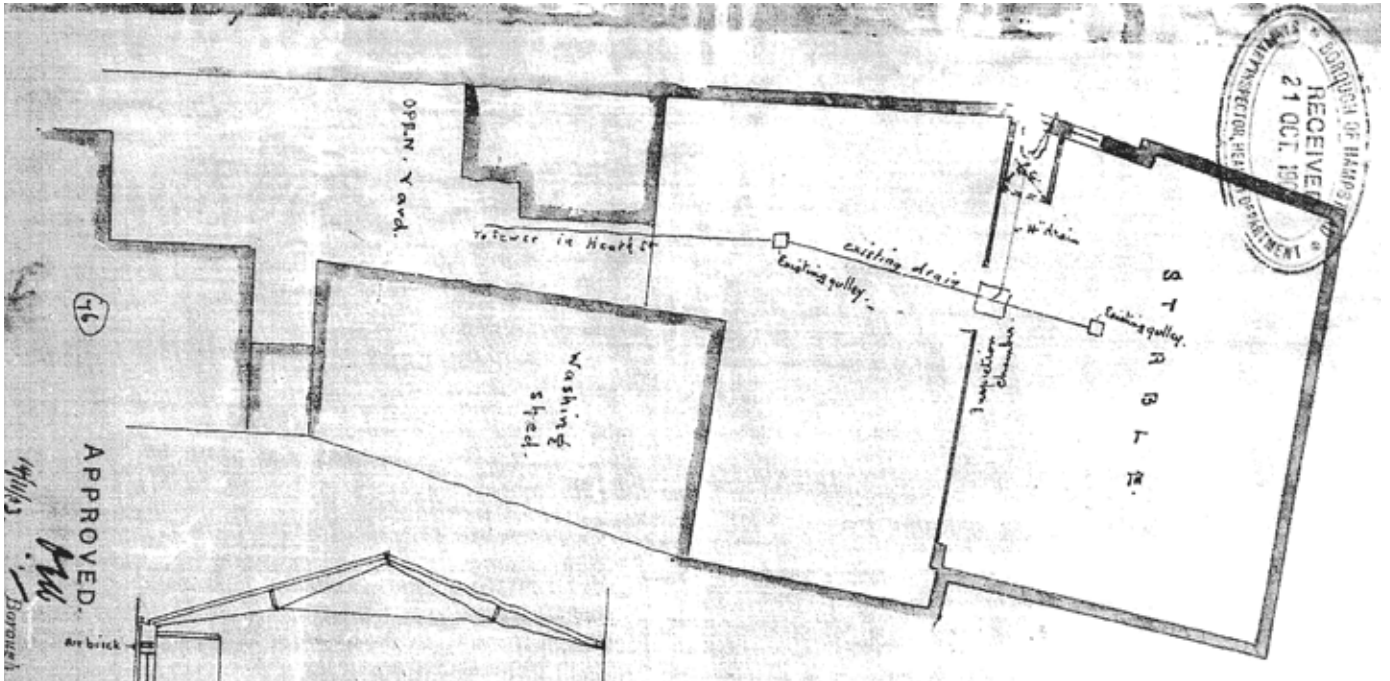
drainage plan showing open yard, washing shed and stables
